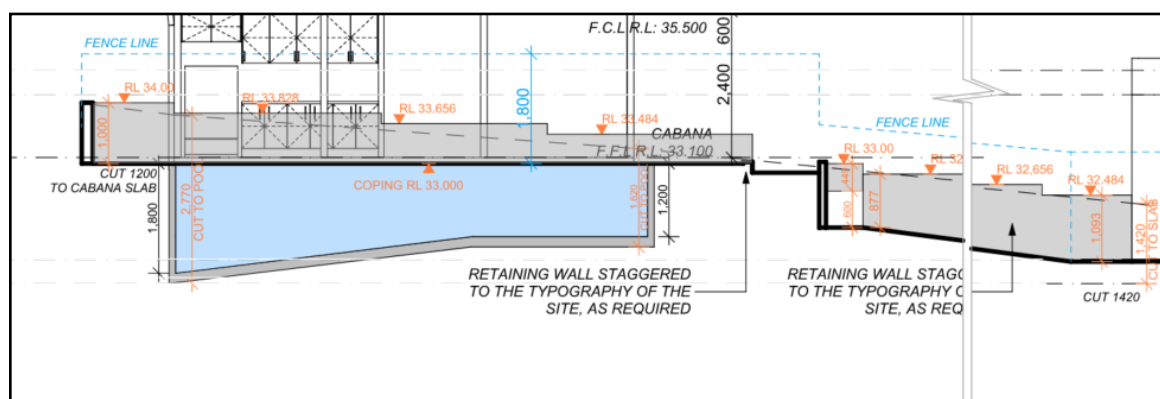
Western Elevation - 54 Daunt Avenue - Demonstrating the retaining walls required (Source: Prime Design)
